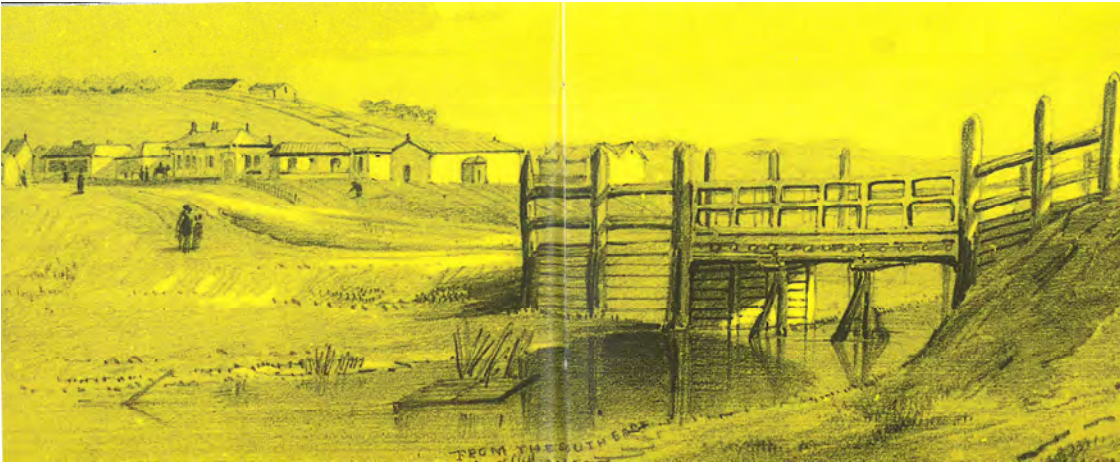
Timber bridge over Moonee Ponds Creek, as sketched by William Jarrett, 1851
